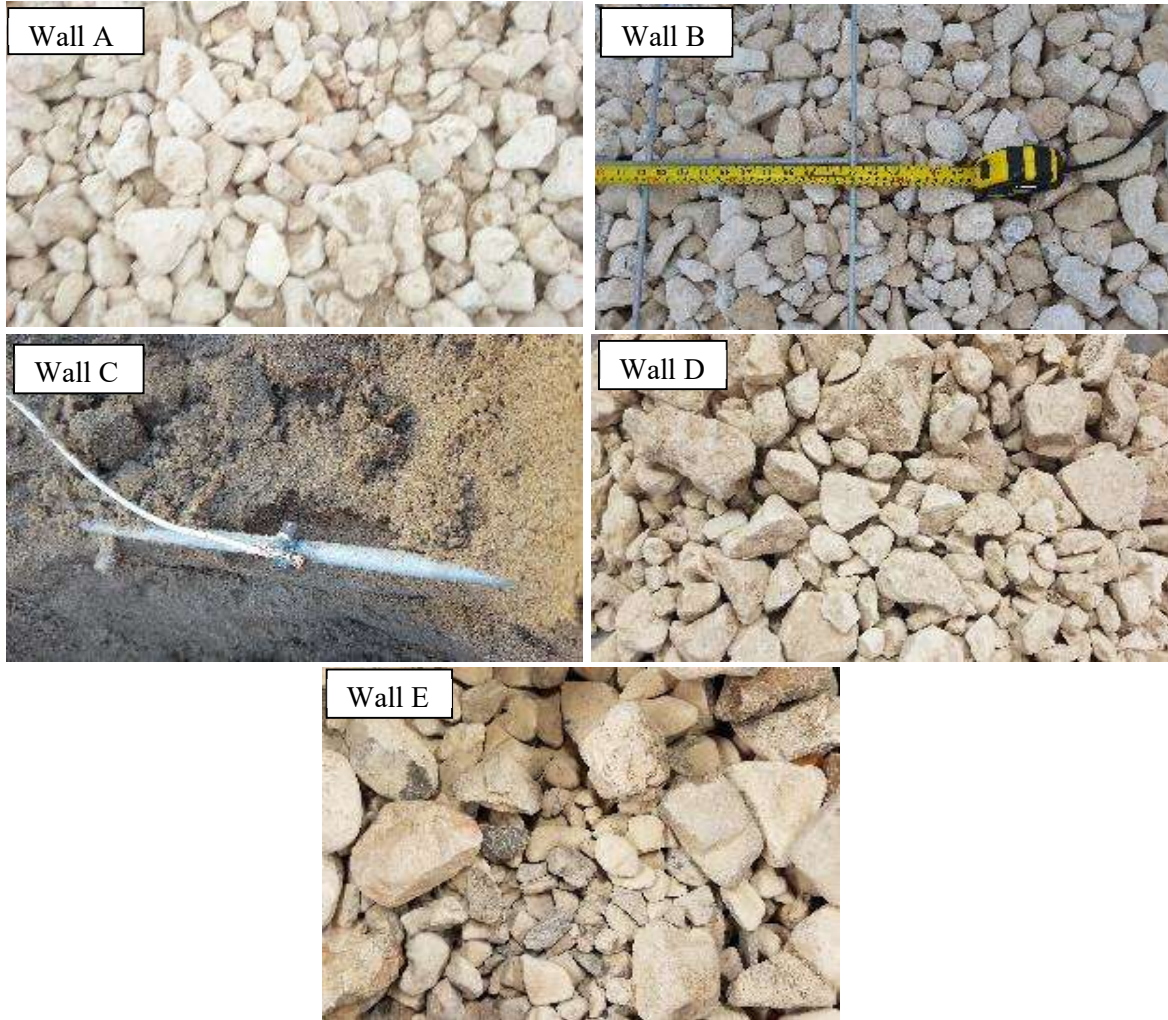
Backfill Material of Instrumented MSE Walls
